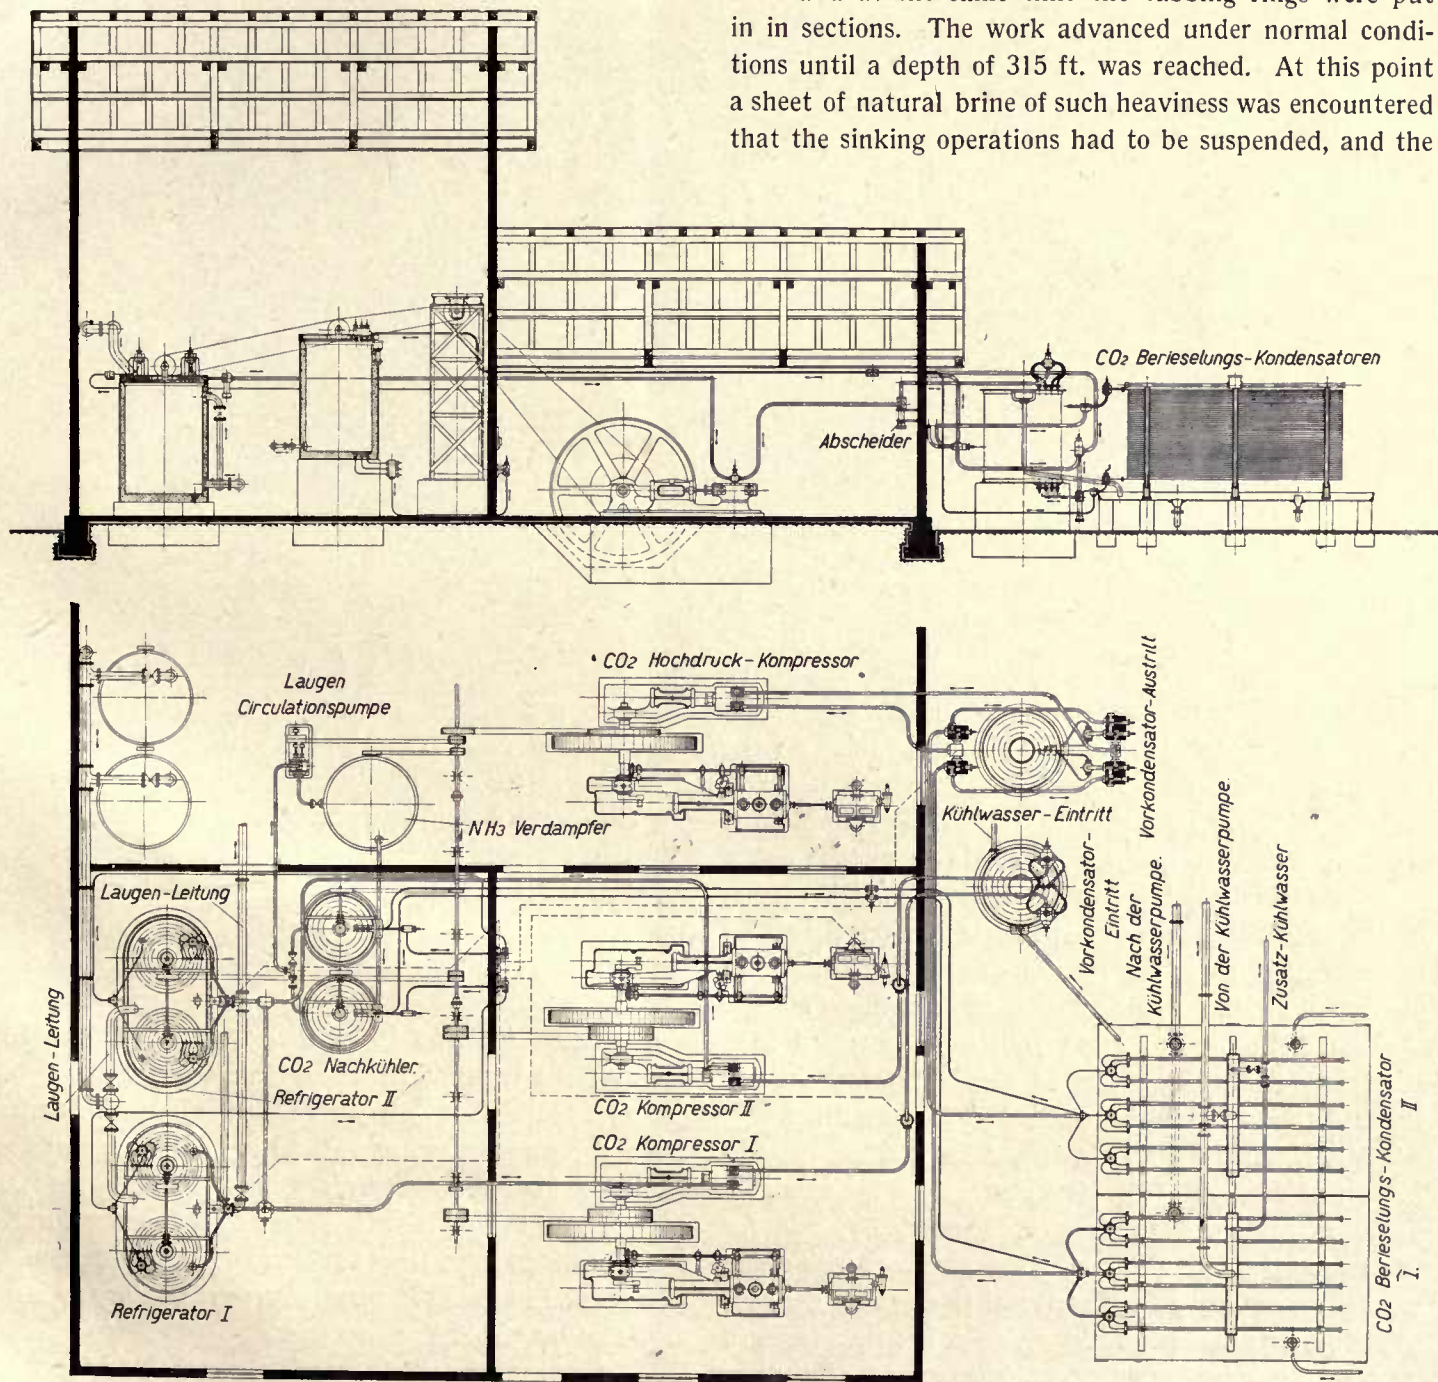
General Arrangement of the Refrigerating Machine Plant
